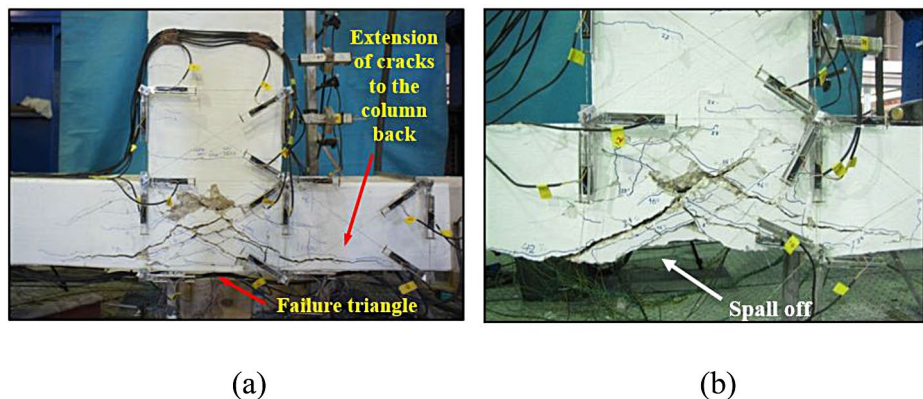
Typical damage of bare joints: (a) JA-3, and (b) JC-1
